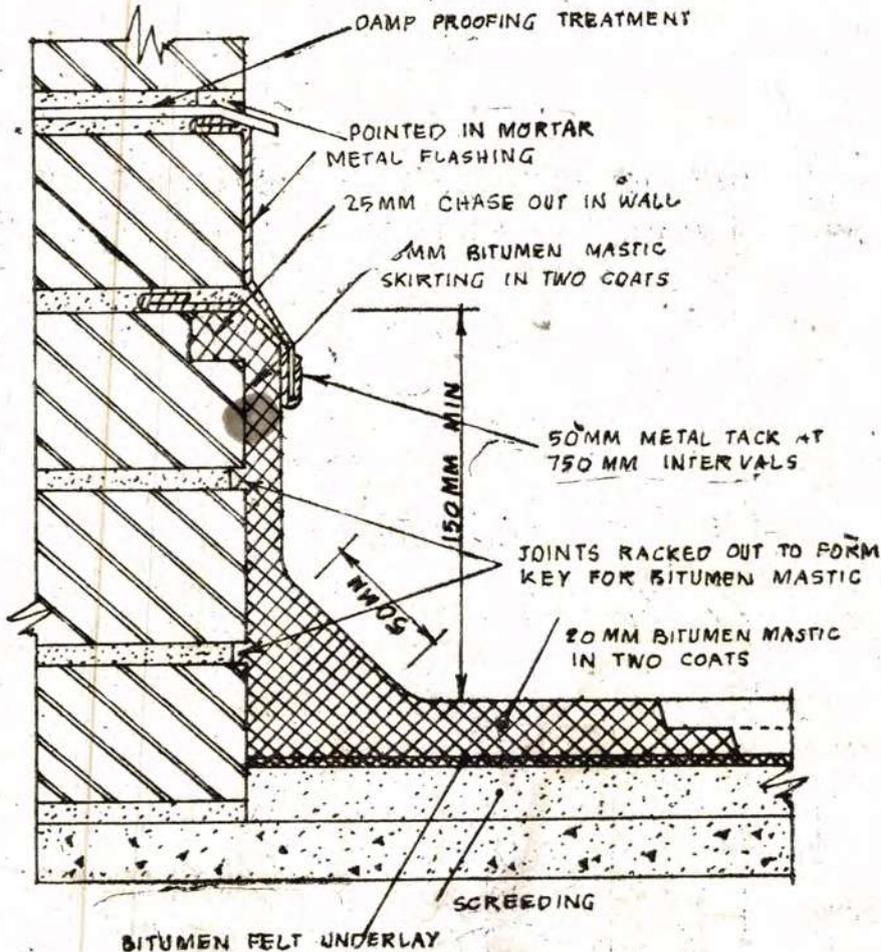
BITUMEN MASTIC LAID ON SCREED ROOF AND BITUMEN MASTIC SKIRTING TO BRICK WALL
